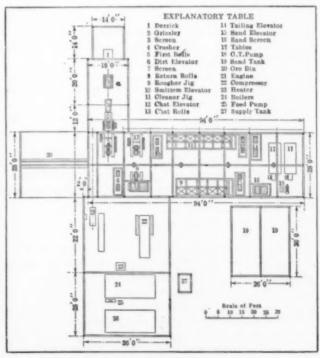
FLOOR PLAN OF BOHEMIAN GIRL MILL
